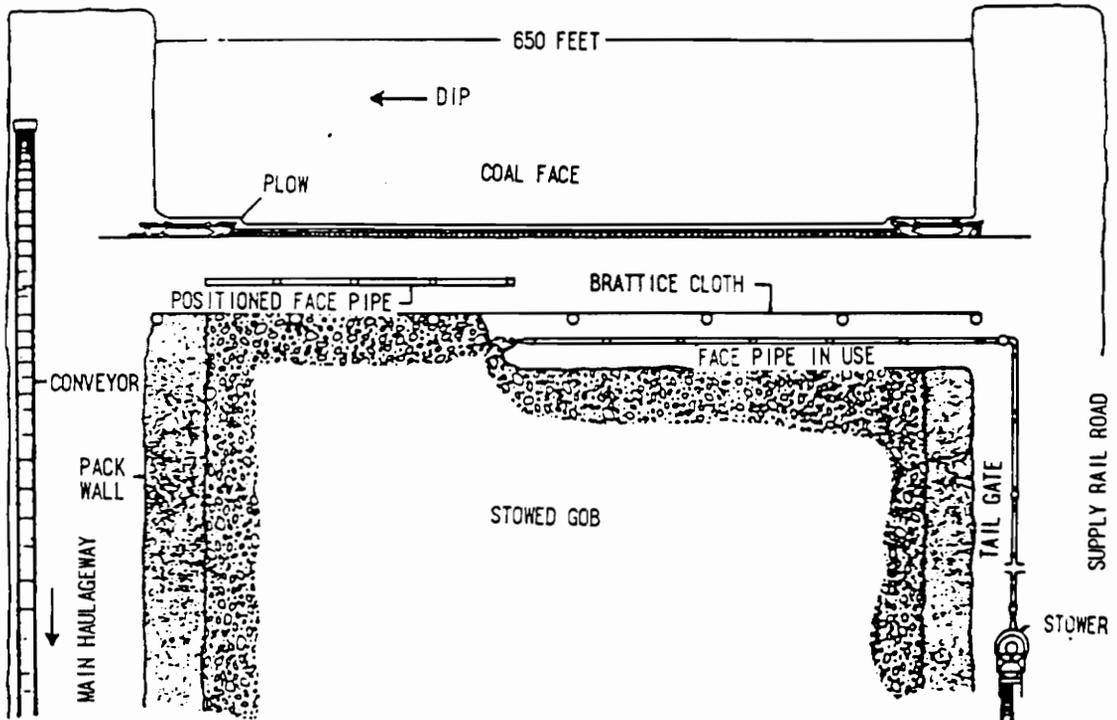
Conventional pneumatic-stowing layout for a longwall face
